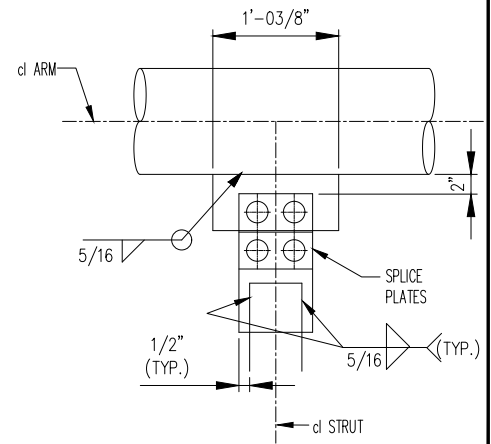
(WELDED CONNECTION ALTERNATIVE)
